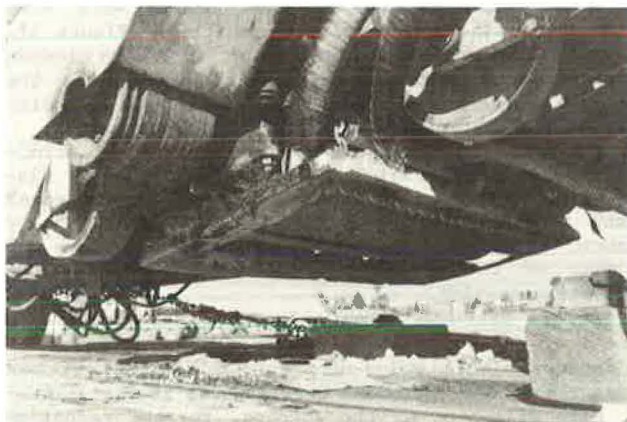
Grinding arbor—a cutting wheel composed of diamond chips embedded in steel disks.
